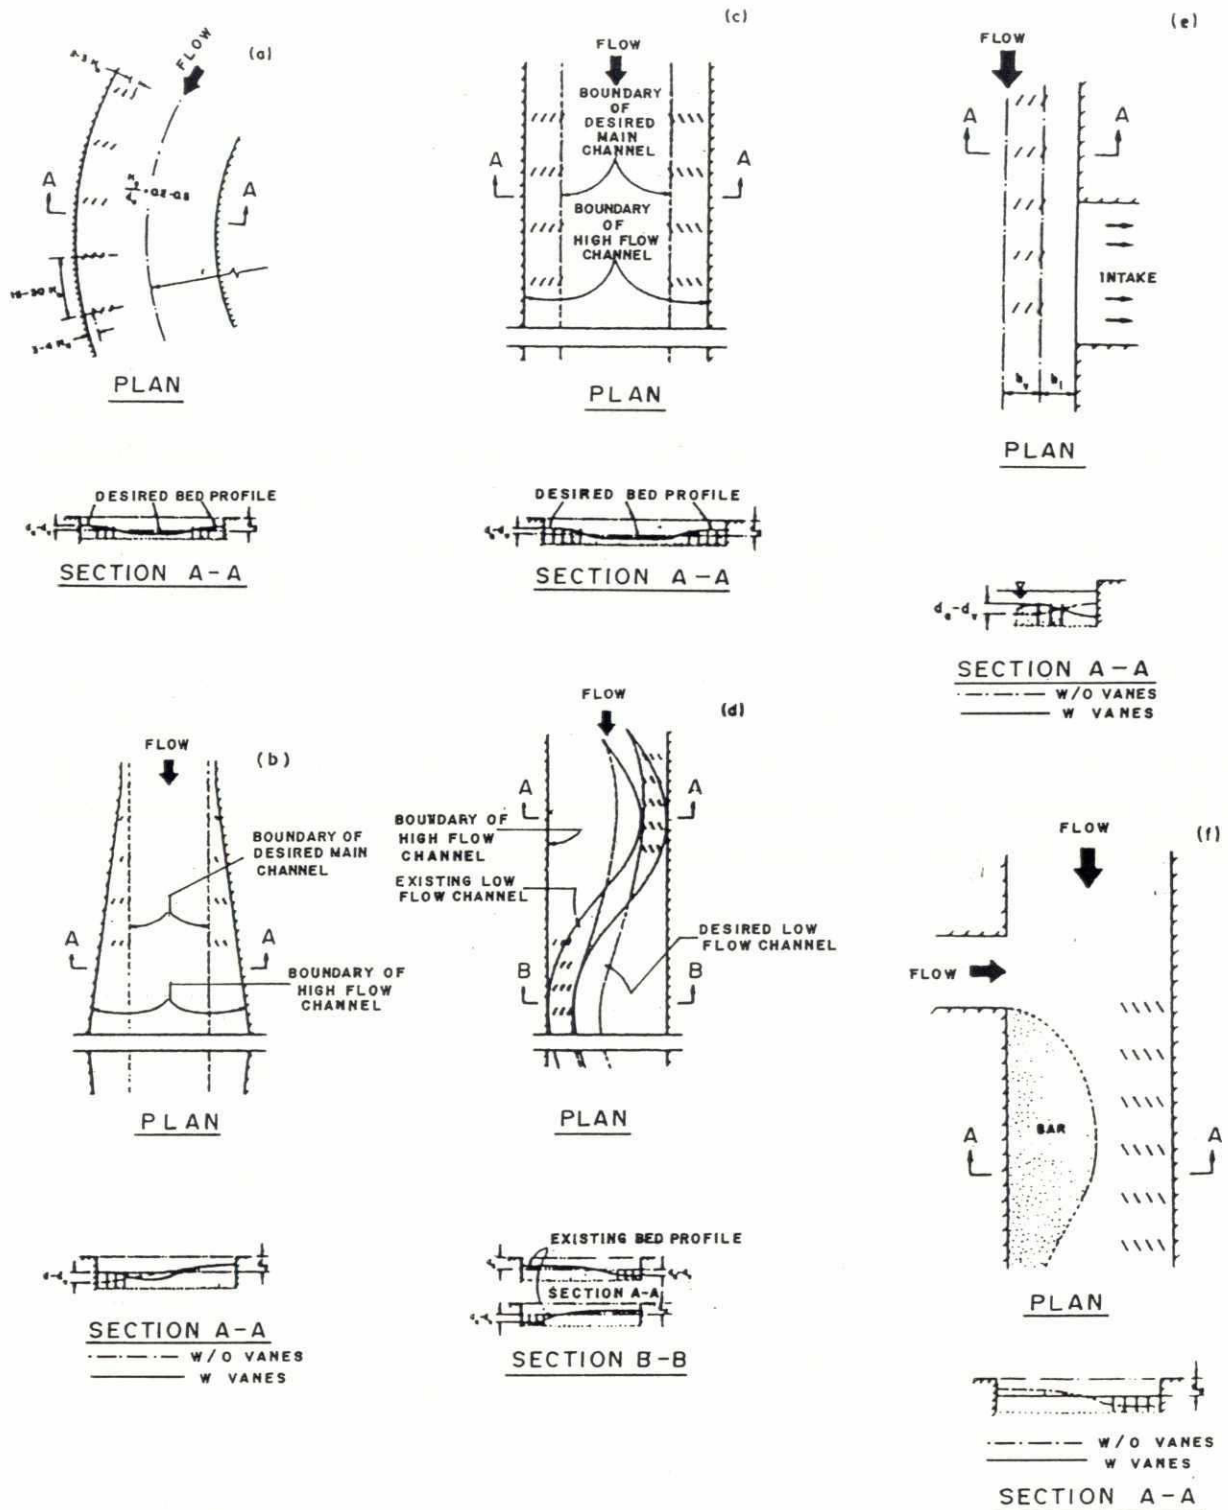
Typical Vane Layouts for Stream-Bank Protection and/or Shoaling Control:
